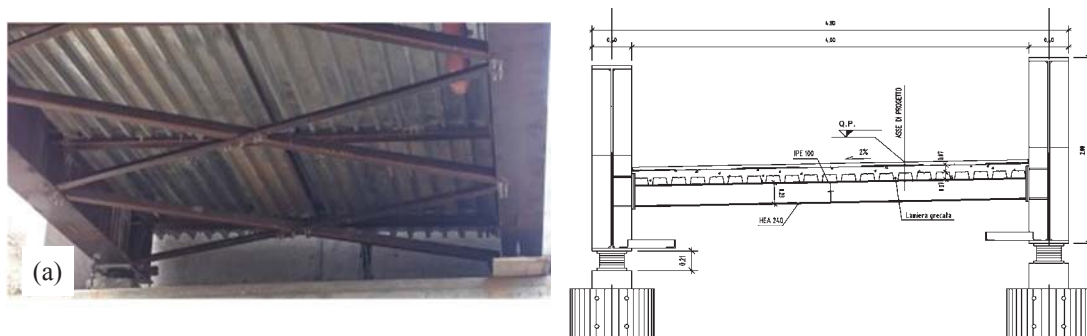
Lambro footbridge: (a) view from below; and (b) cross-section.
